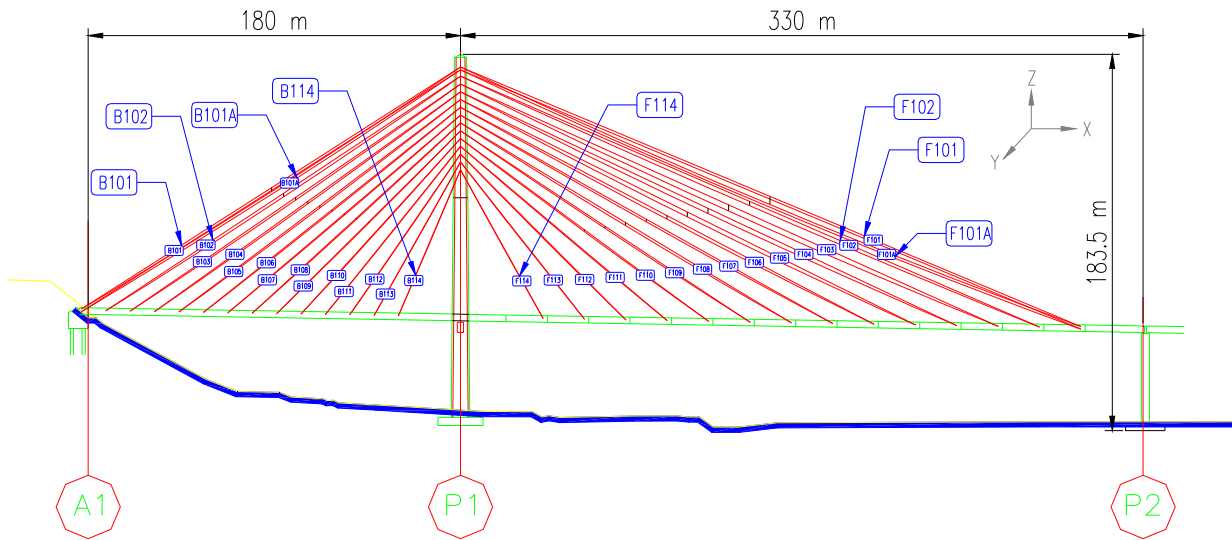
The Kao Ping Hsi Cable-Stayed Bridge
